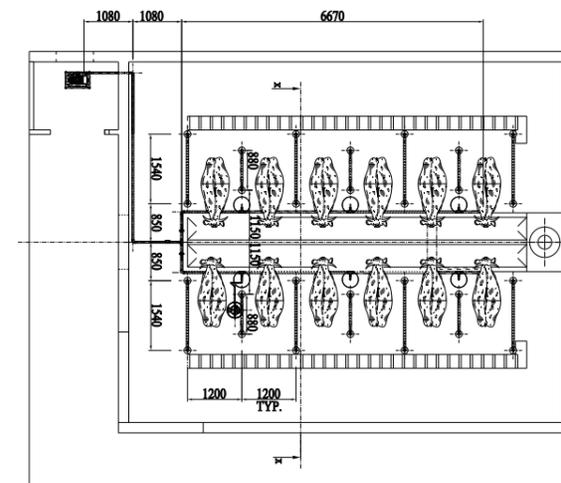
(a) Milking Machine Installation Schematic in cow shed-with dimensions
